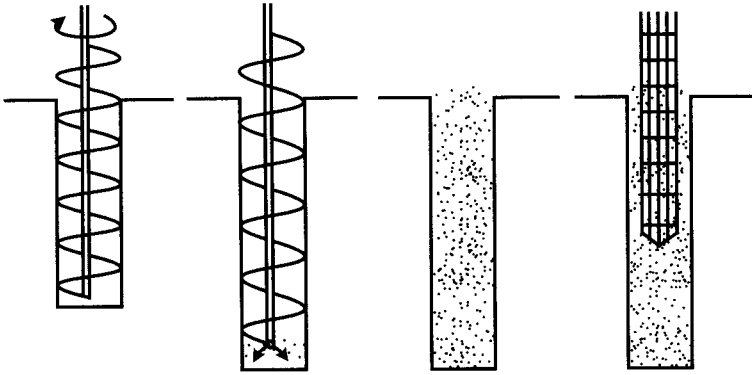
Construction procedure of a packed in place (PIP) pile.
